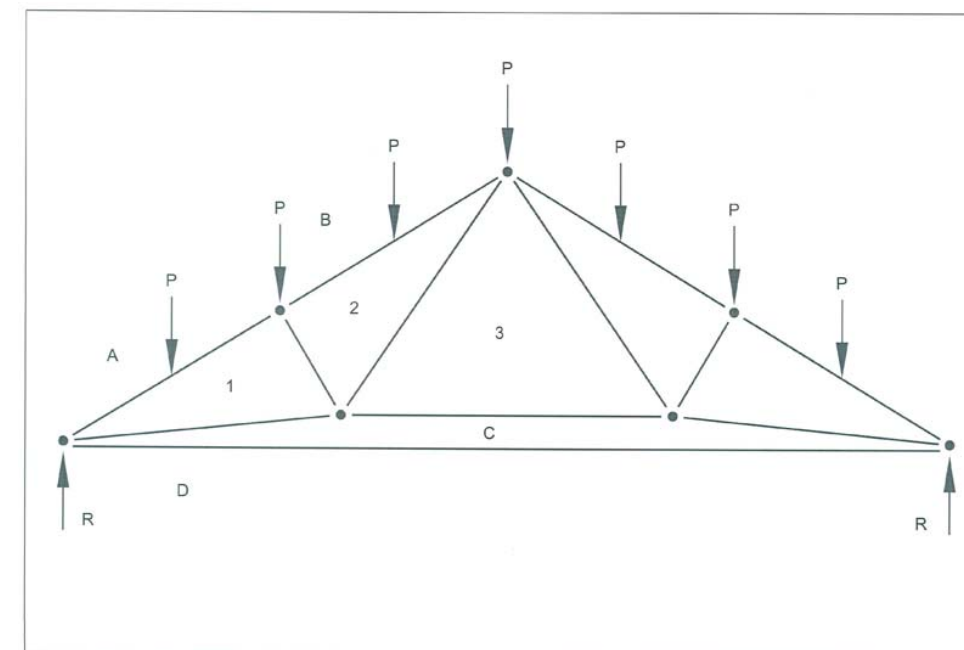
This shows the placement of the unit loads for the load test with the loads located at purlins.
